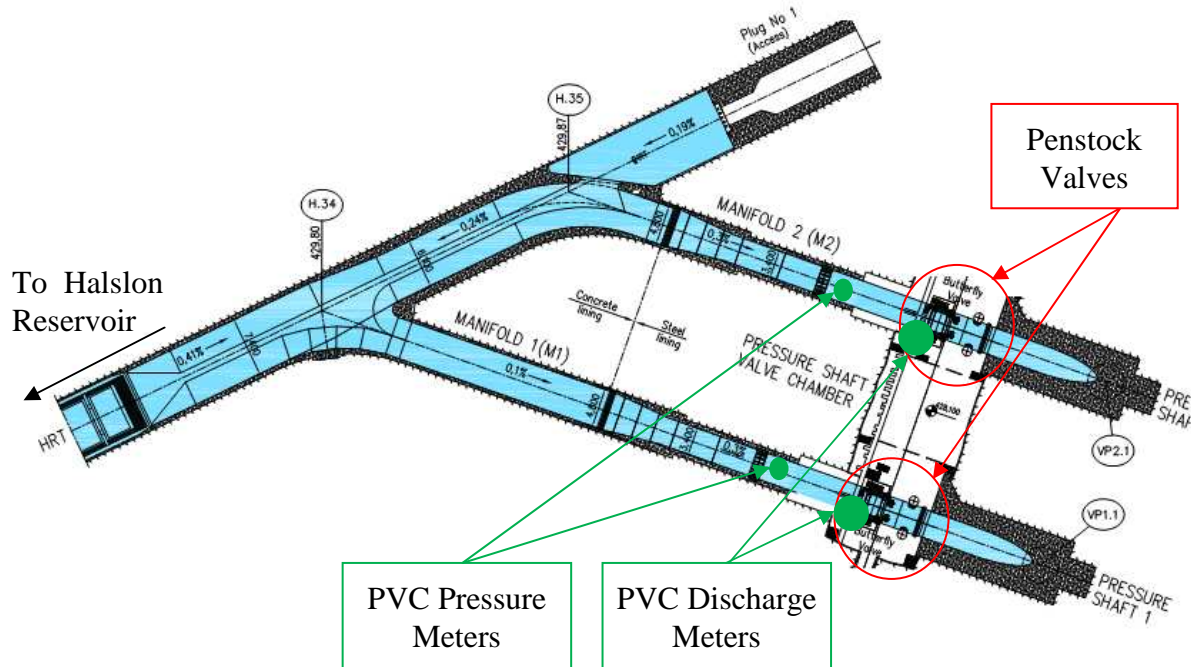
Penstock Valve Chamber Pressure and Discharge meters [5]
